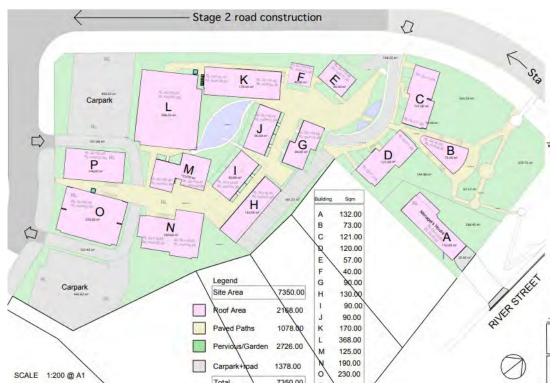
the development will contain 16 buildings and three car parks (from the application documents)
